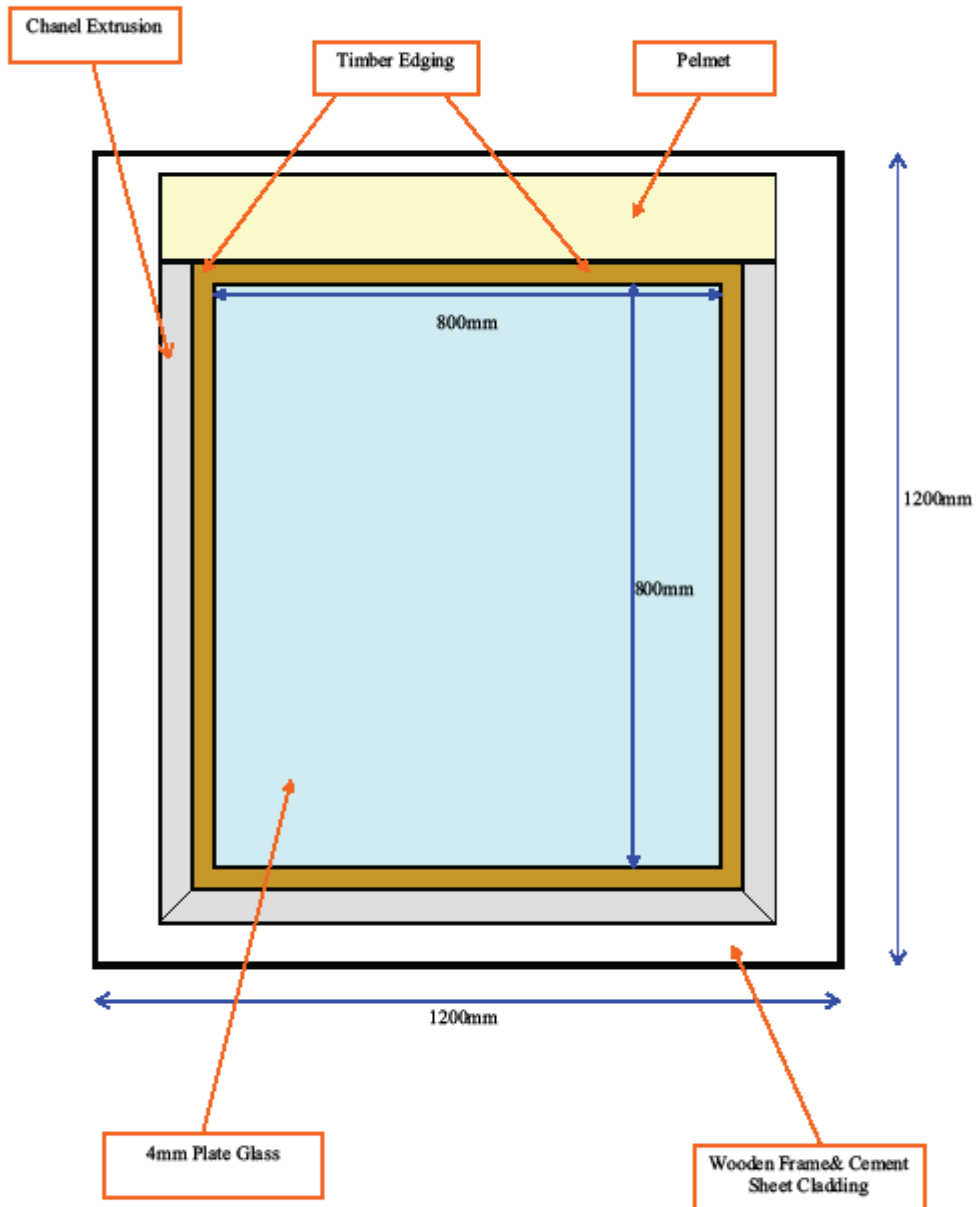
Assembly detail (Drawing supplied by test sponsor.)
